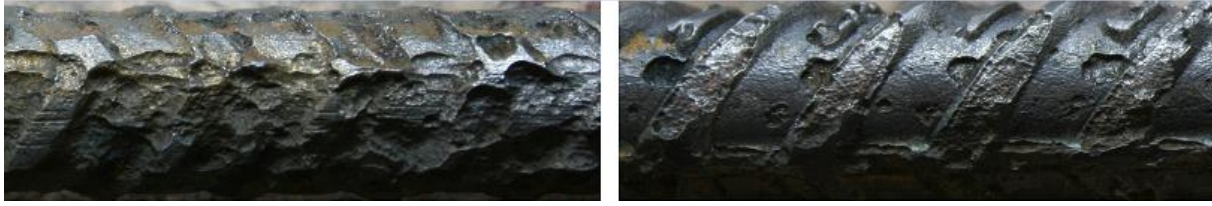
Corrosion configuration: Left: general corrosion; Right: Pitting corrosion
